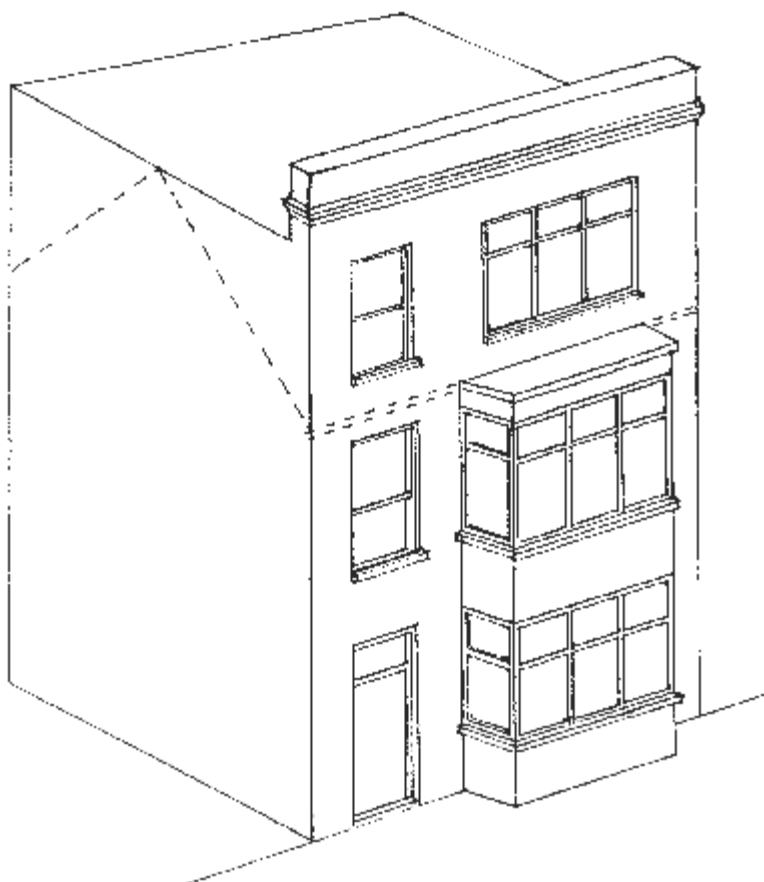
; Type 2; whole floor extension with flat roof behind parapet in wall to match existing 1st floor construction; diagrammatic view of single house.
